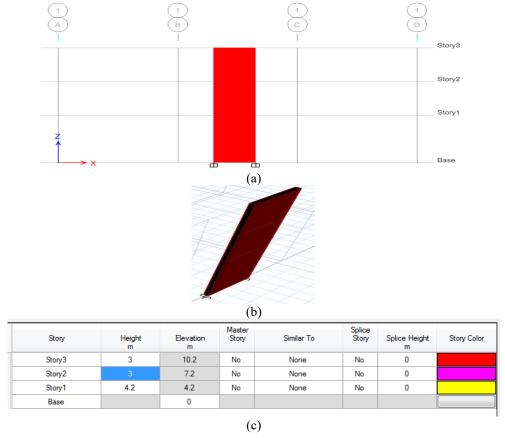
(a) Modeled RC Shear Wall. (b) RC Shear Wall Isometric View. (c) Elevation of various storey height RC shear wall.
